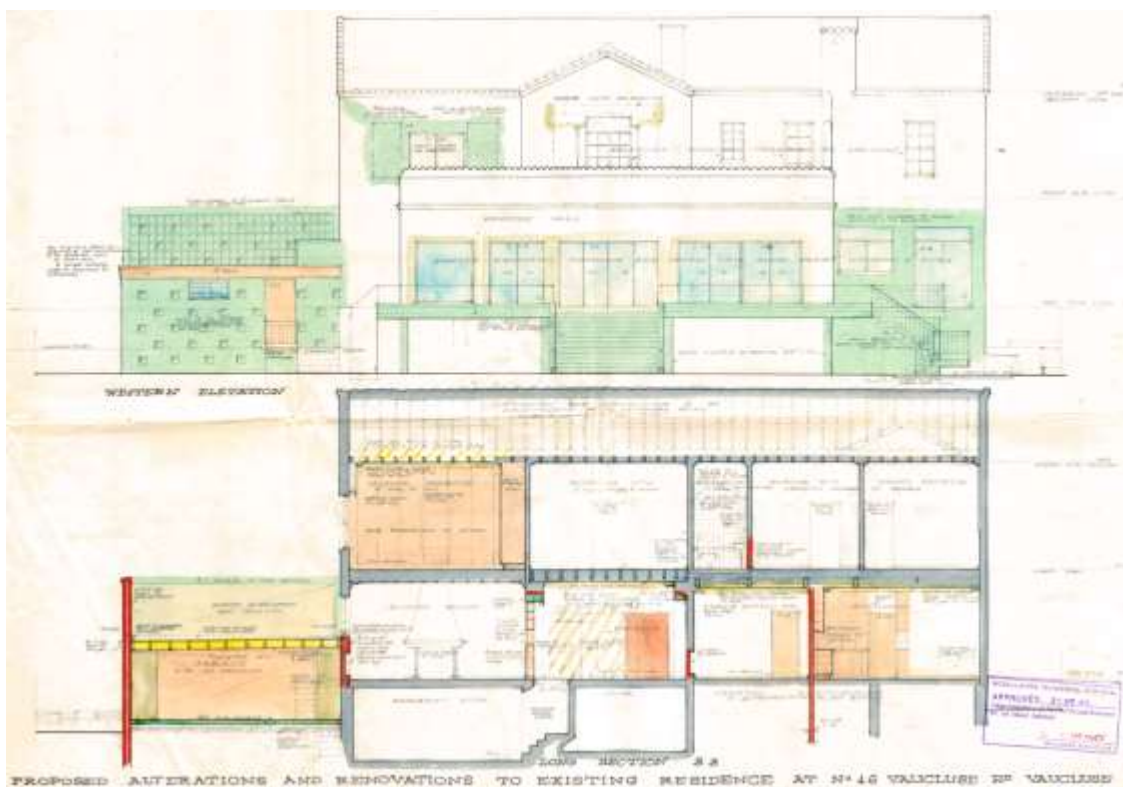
Rear elevation and section showing areas of change approved as part of the 1960/61 J. W. Roberts scheme.
